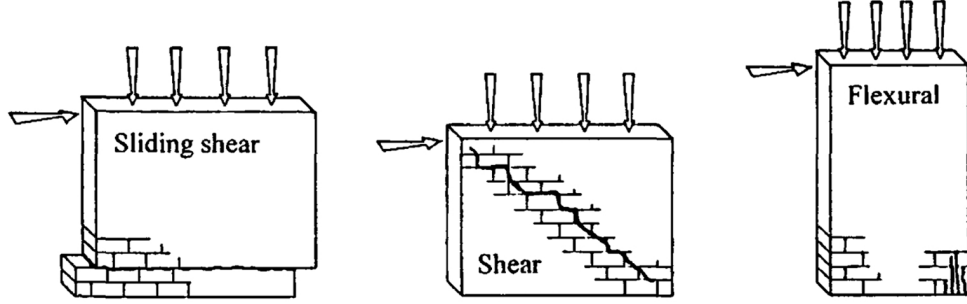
In-plane failure modes of masonry panels subjected to seismic loads (from Tomažević, 1999). From left to right, shear failure with sliding, shear failure with diagonal cracking, flexural failure with rocking and crushing.
